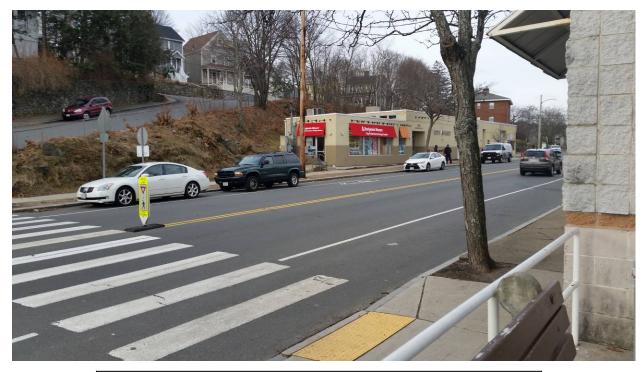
Mass Ave at Dundee Road/Trader Joe's Crosswalk
